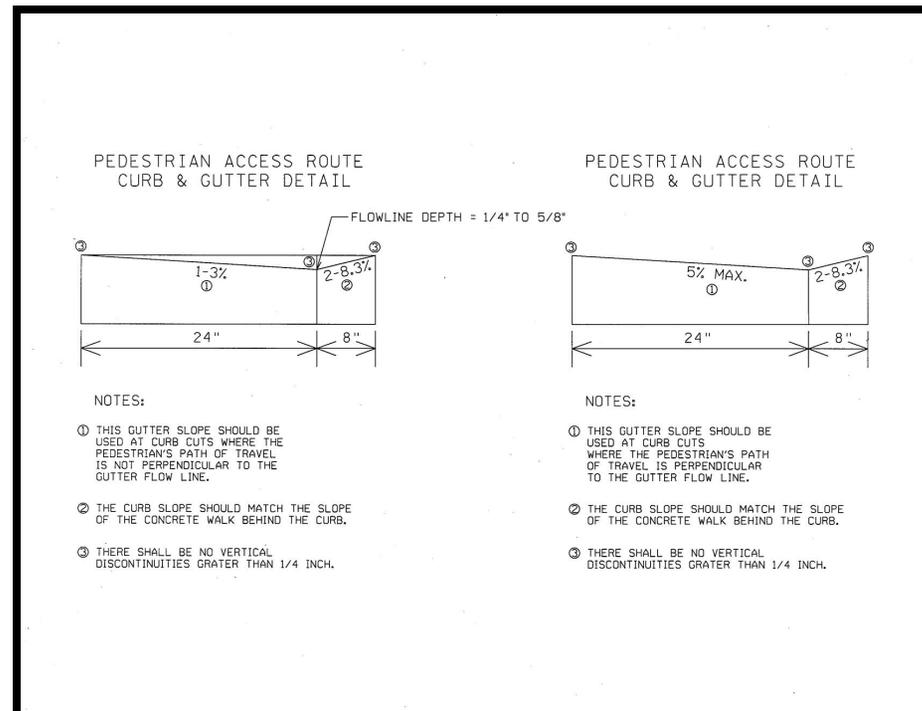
Curb and Gutter – Standard and Pedestrian Access Route
